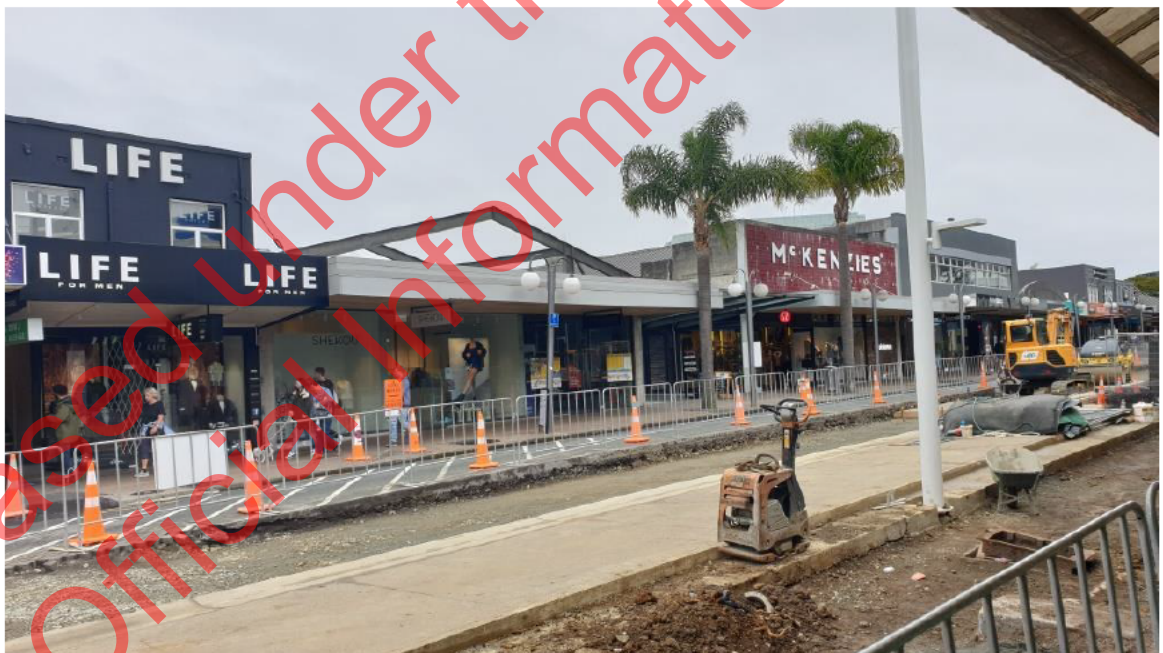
Southern end of project area on Hurstmere Road, looking south. The McKenzies Building at 21 Hurstmere Road is the southernmost building in the project area on this frontage
